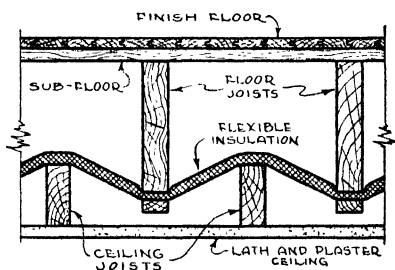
Flexible Insulation Installed between Ceiling and Floor Joists
